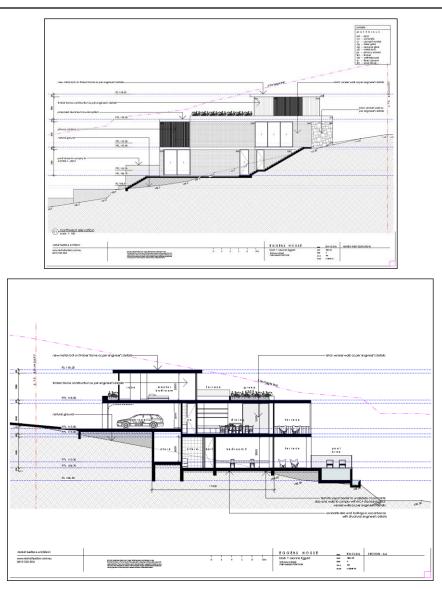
Pages13, 14 & above illustrates as proposed Lower & Middle Floor Plans, Elevations & Sections.
